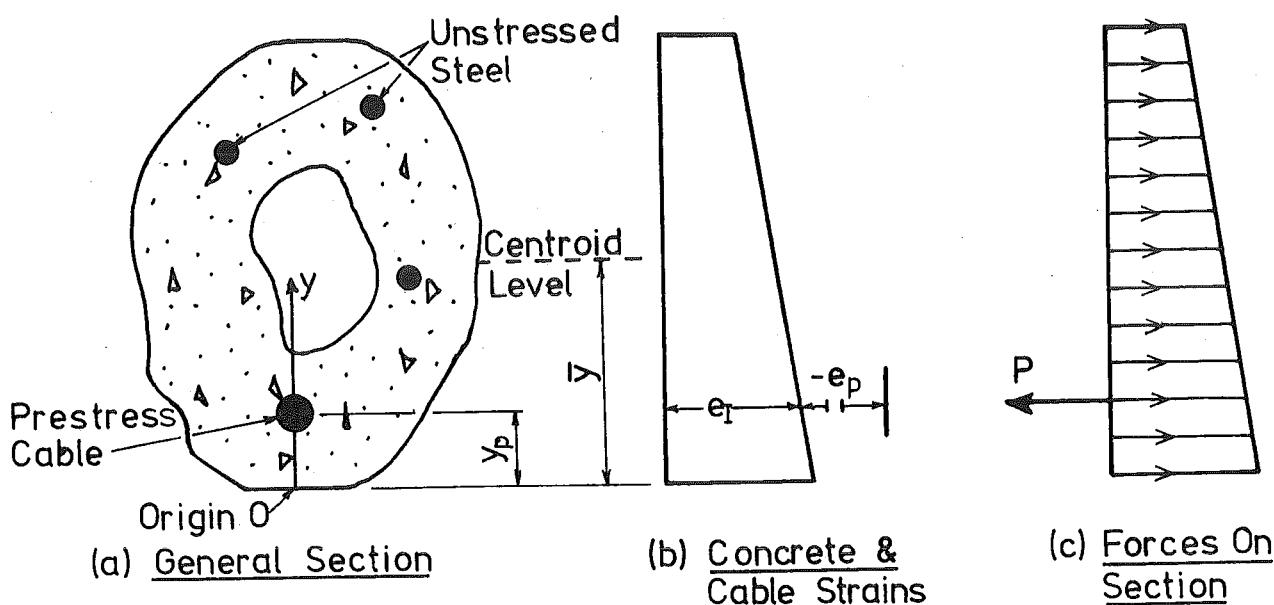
GENERAL UNCRACKED PRESTRESSED CONCRETE SECTION UNDER PRESTRESS PLUS DEAD LOAD
